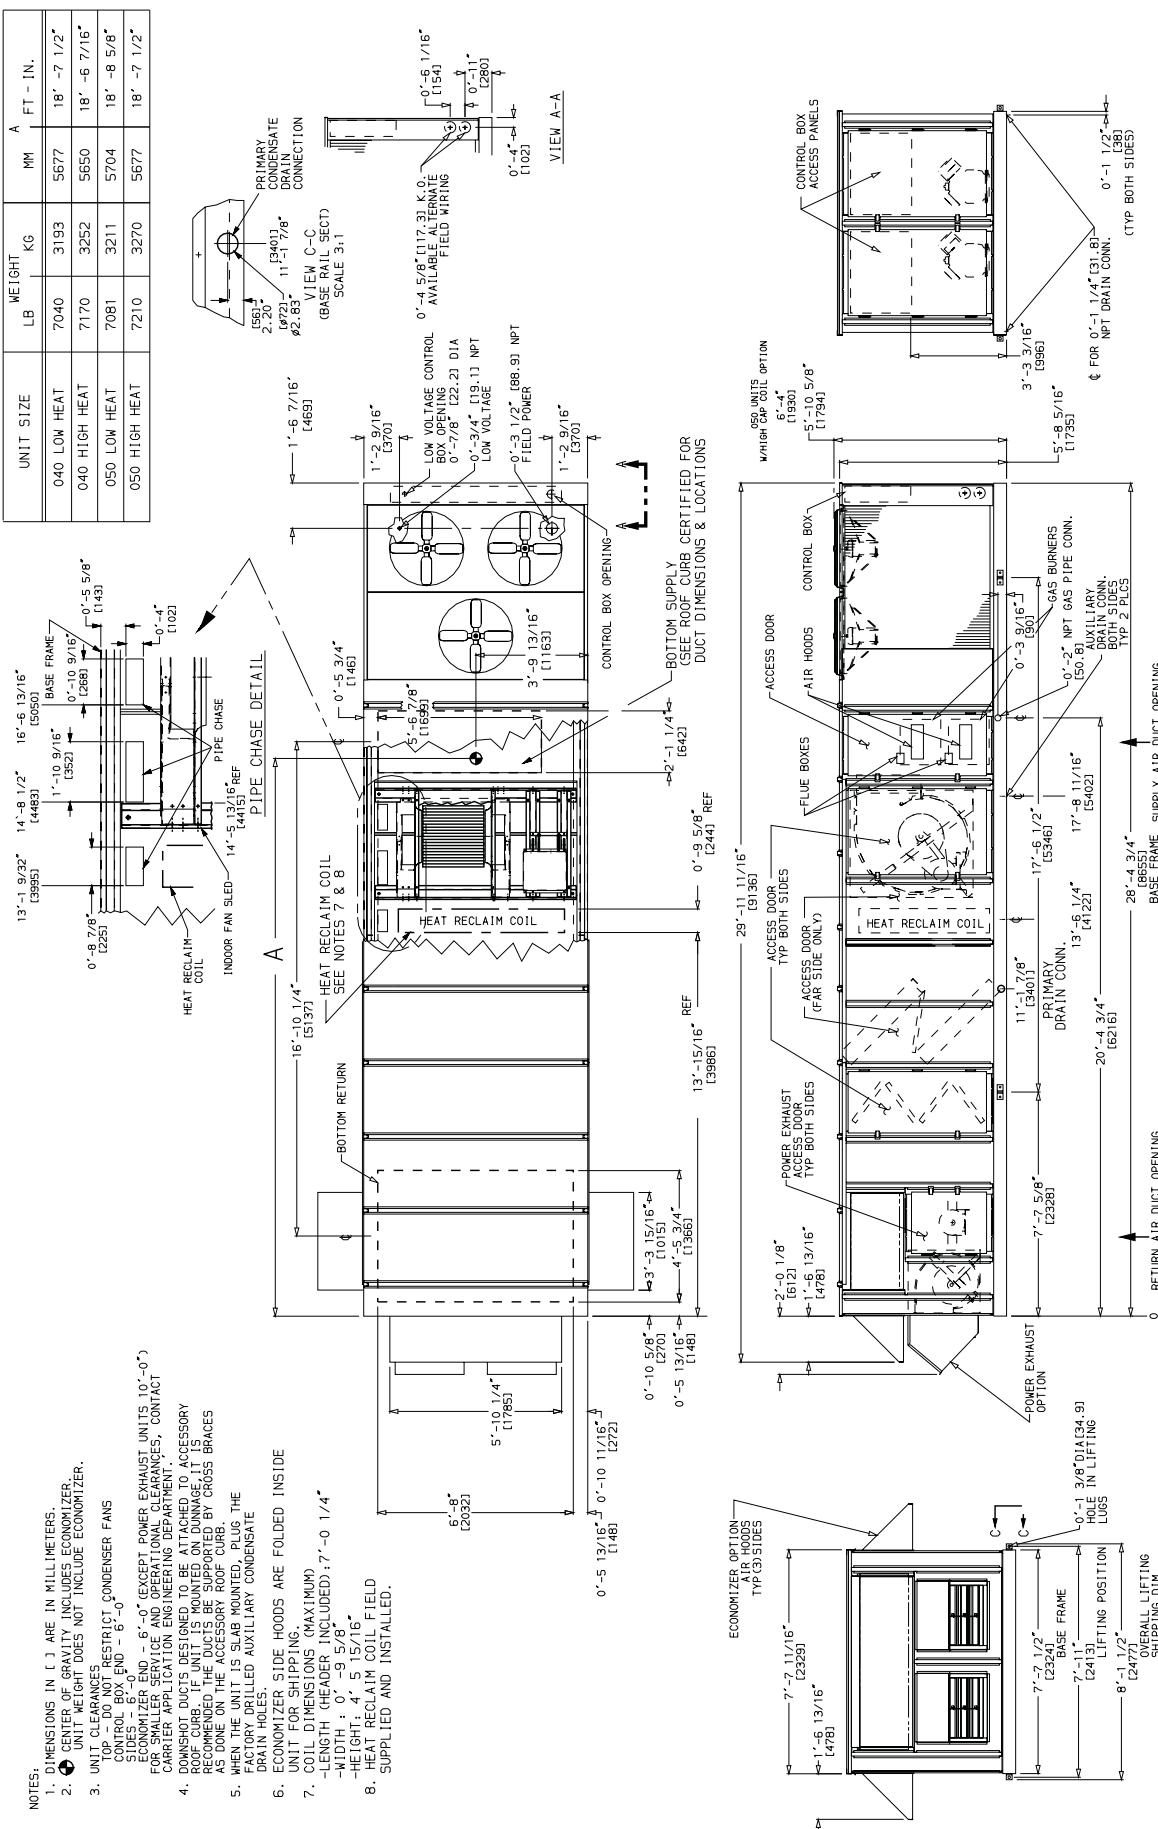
Base Unit Dimensional Drawing — 48ZG,ZN040,050 (Extended Chassis)
